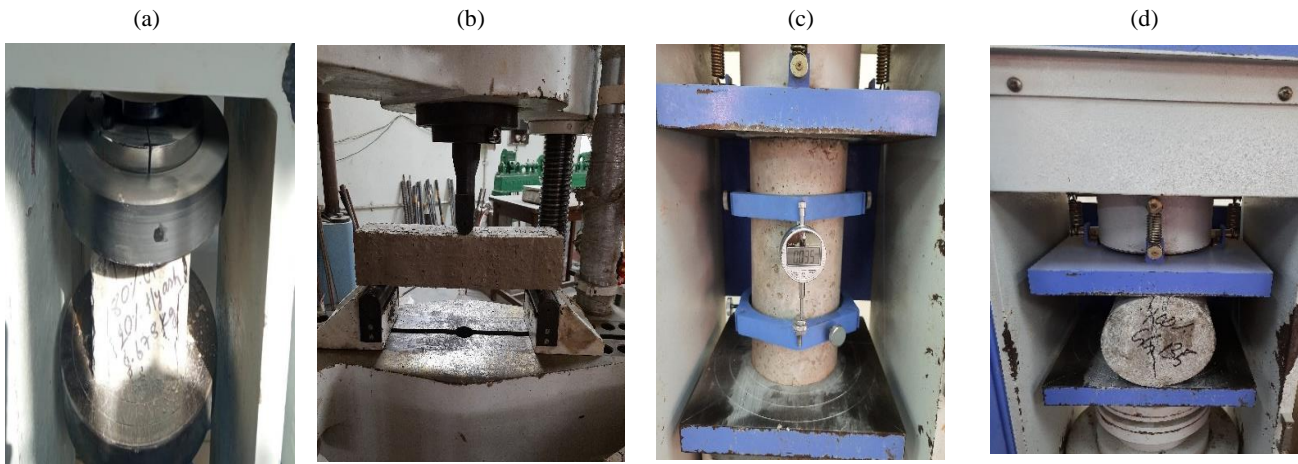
a) Compressive test of the cube specimen. b) Flexural test of the beam specimen. c) Extensometer used to measure deflection with applied uniaxial compression load. d) Split tensile test of the cylinder specimen
